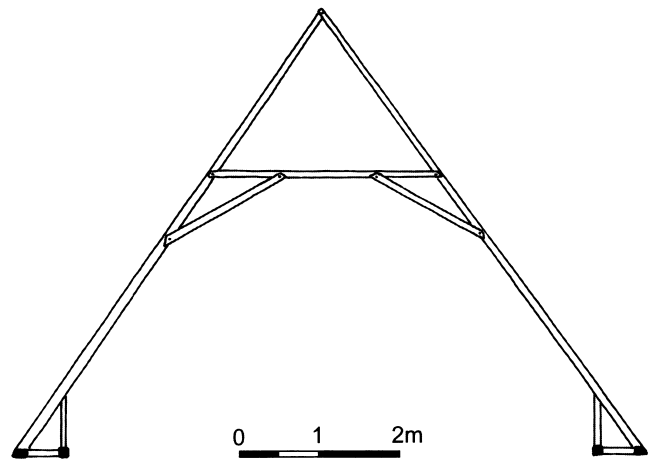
Moreton church, the nave roof of the first half of the 13th century. (The eaves detail could not be examined and as shown is largely conjectural).
